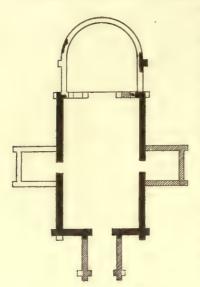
Canterbury. Plan of St. Pancras (VIth or VIIth Century).
